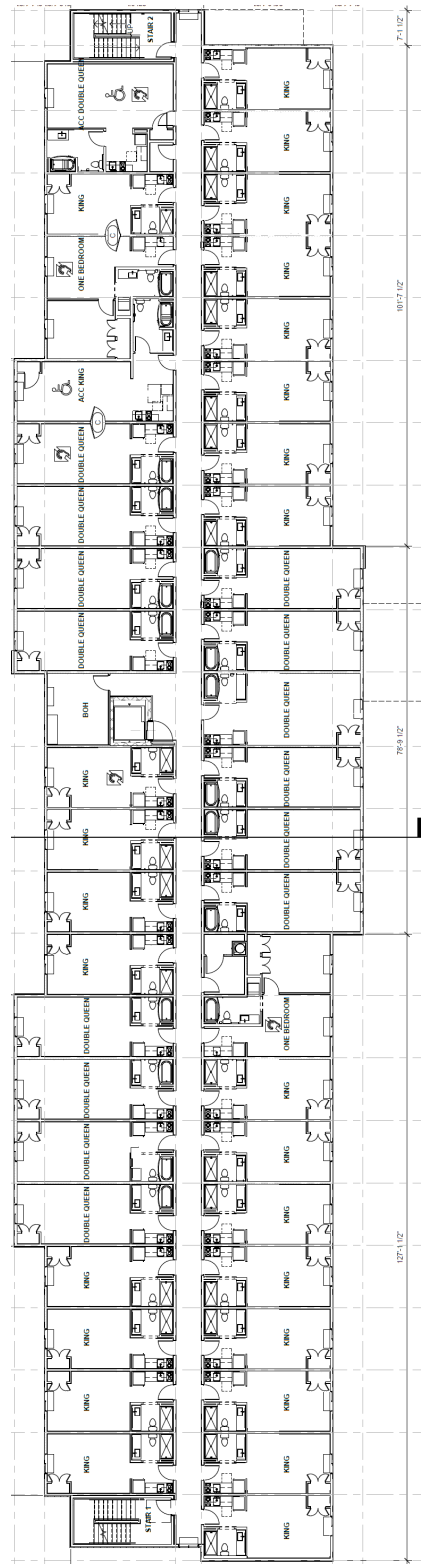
Exhibit D: HOTEL FIRST AND SECOND/THIRD FLOOR PLANS
